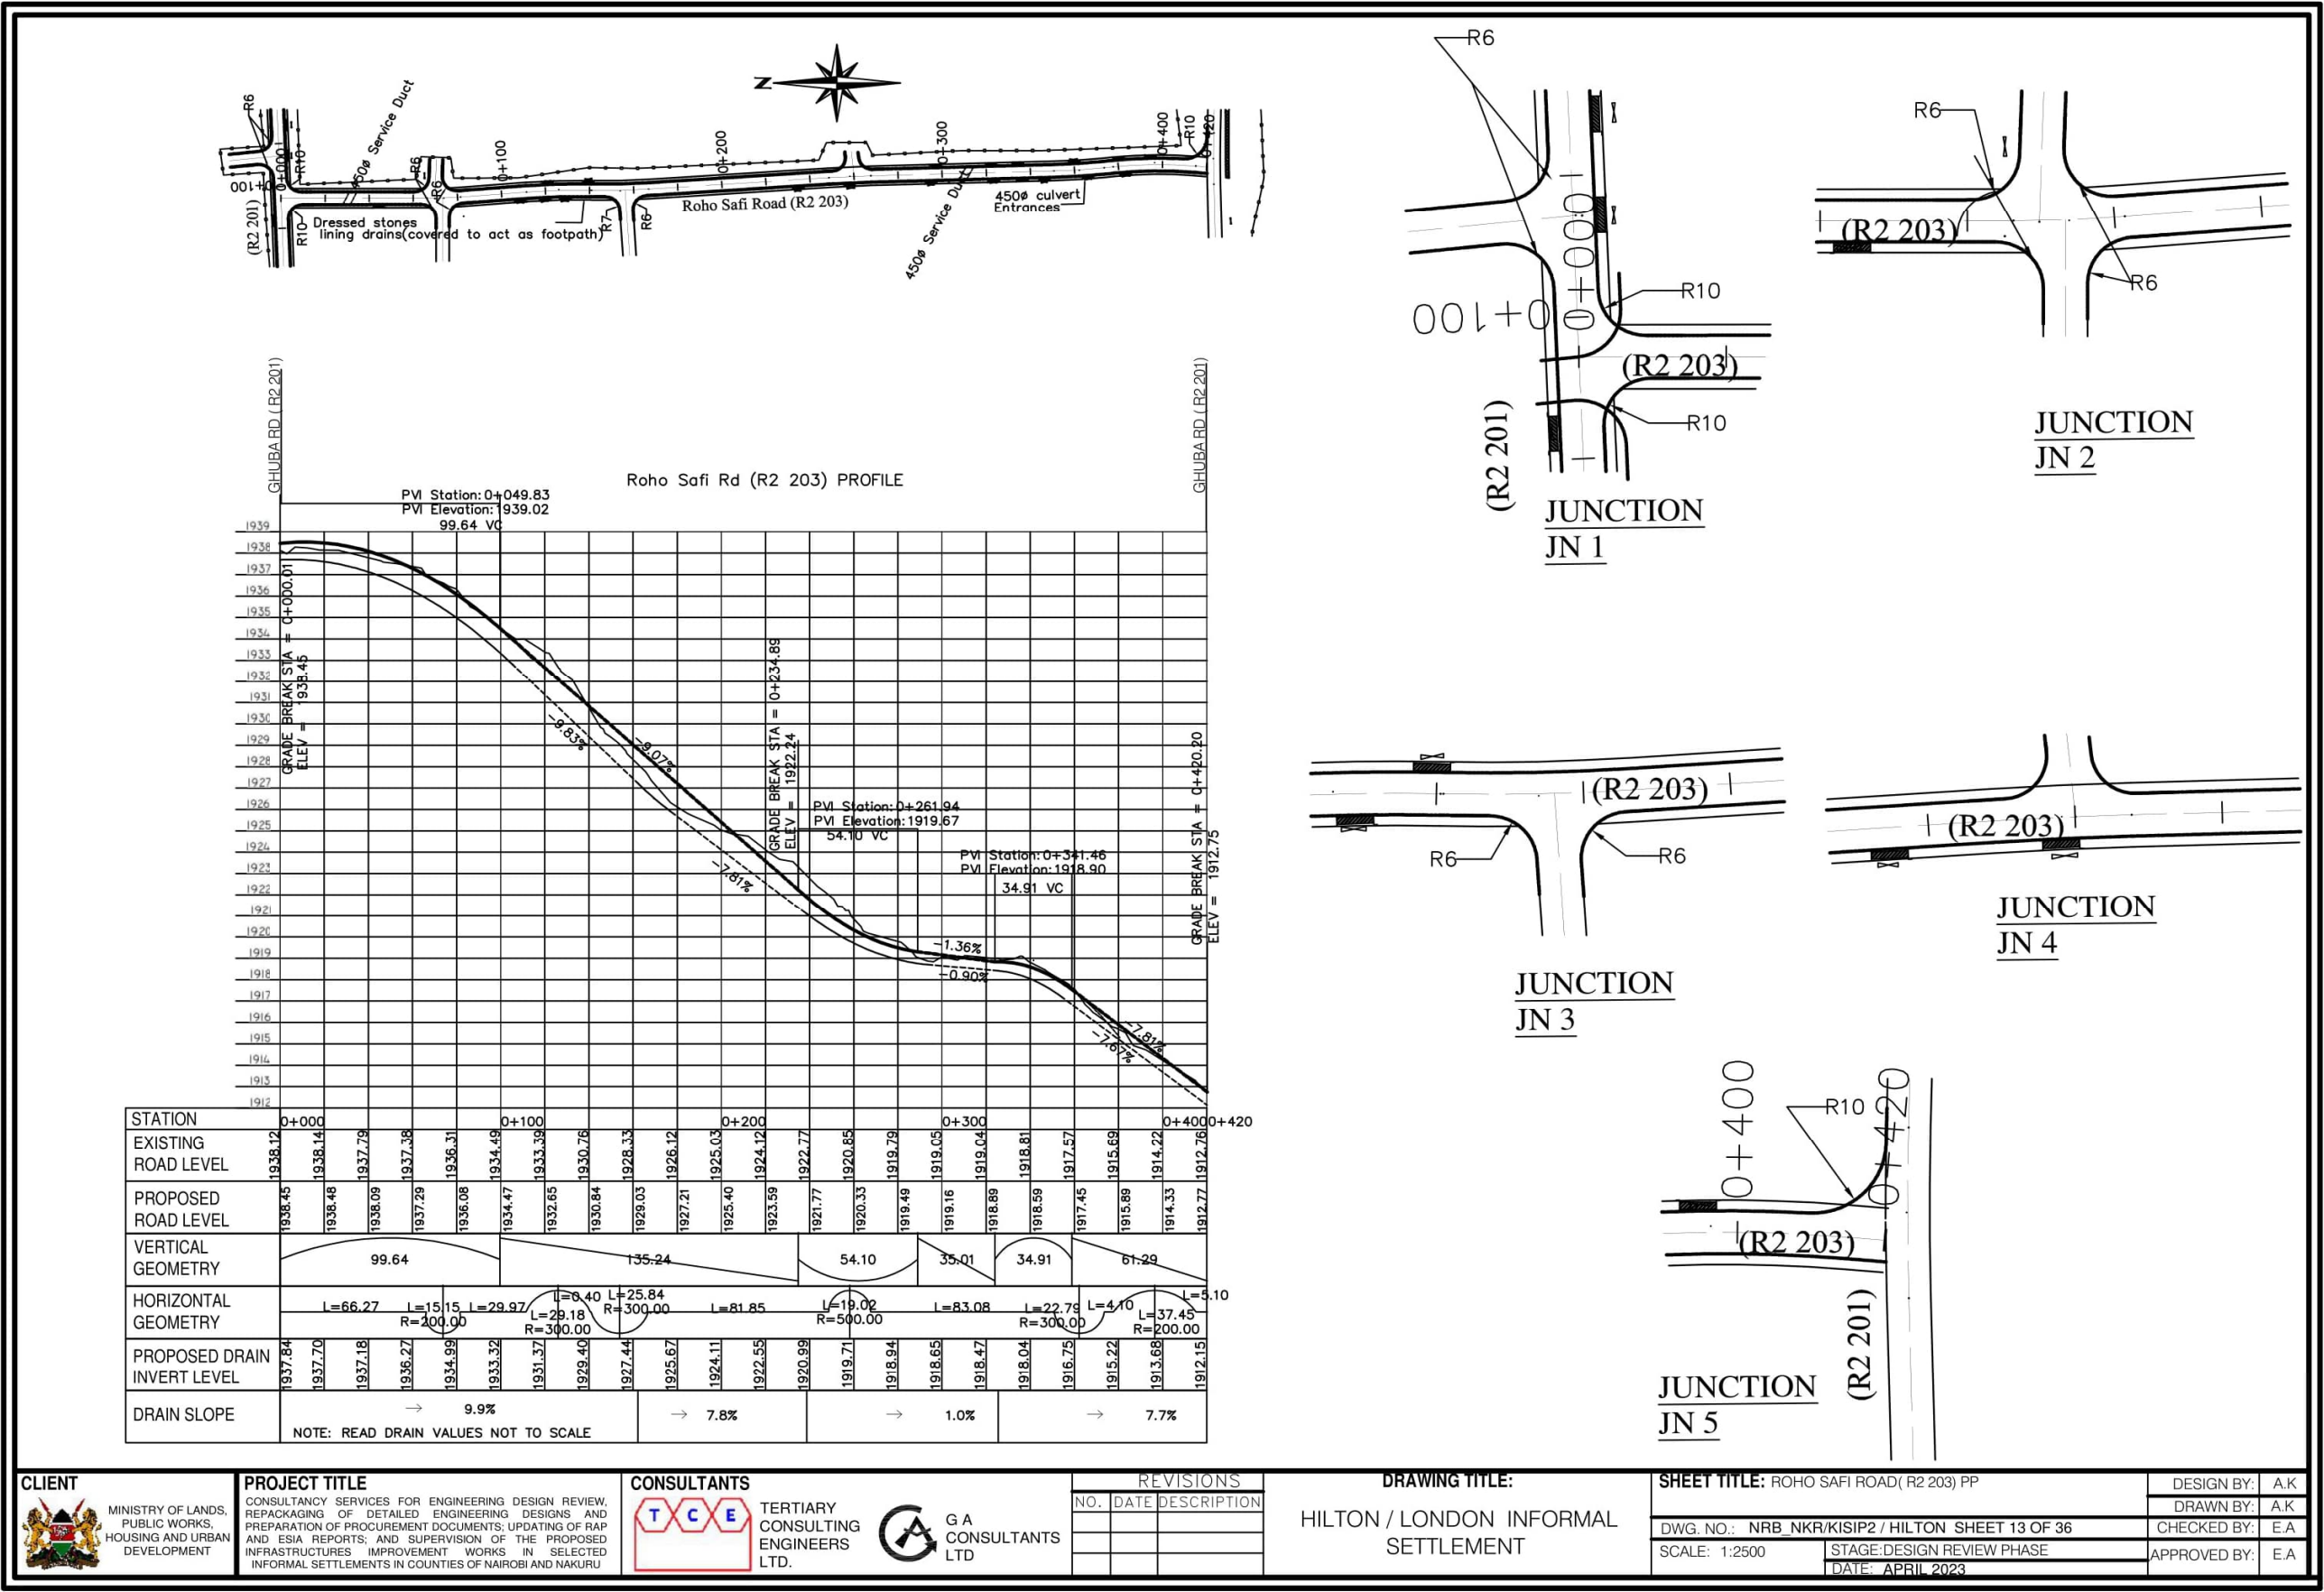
London/Hilton – Roho Safi Road Plan and Profile
